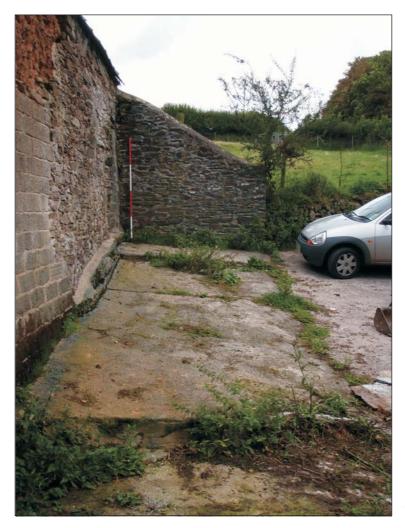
Site of lean-to at northeast corner of barn. View to north (scale 2m)
